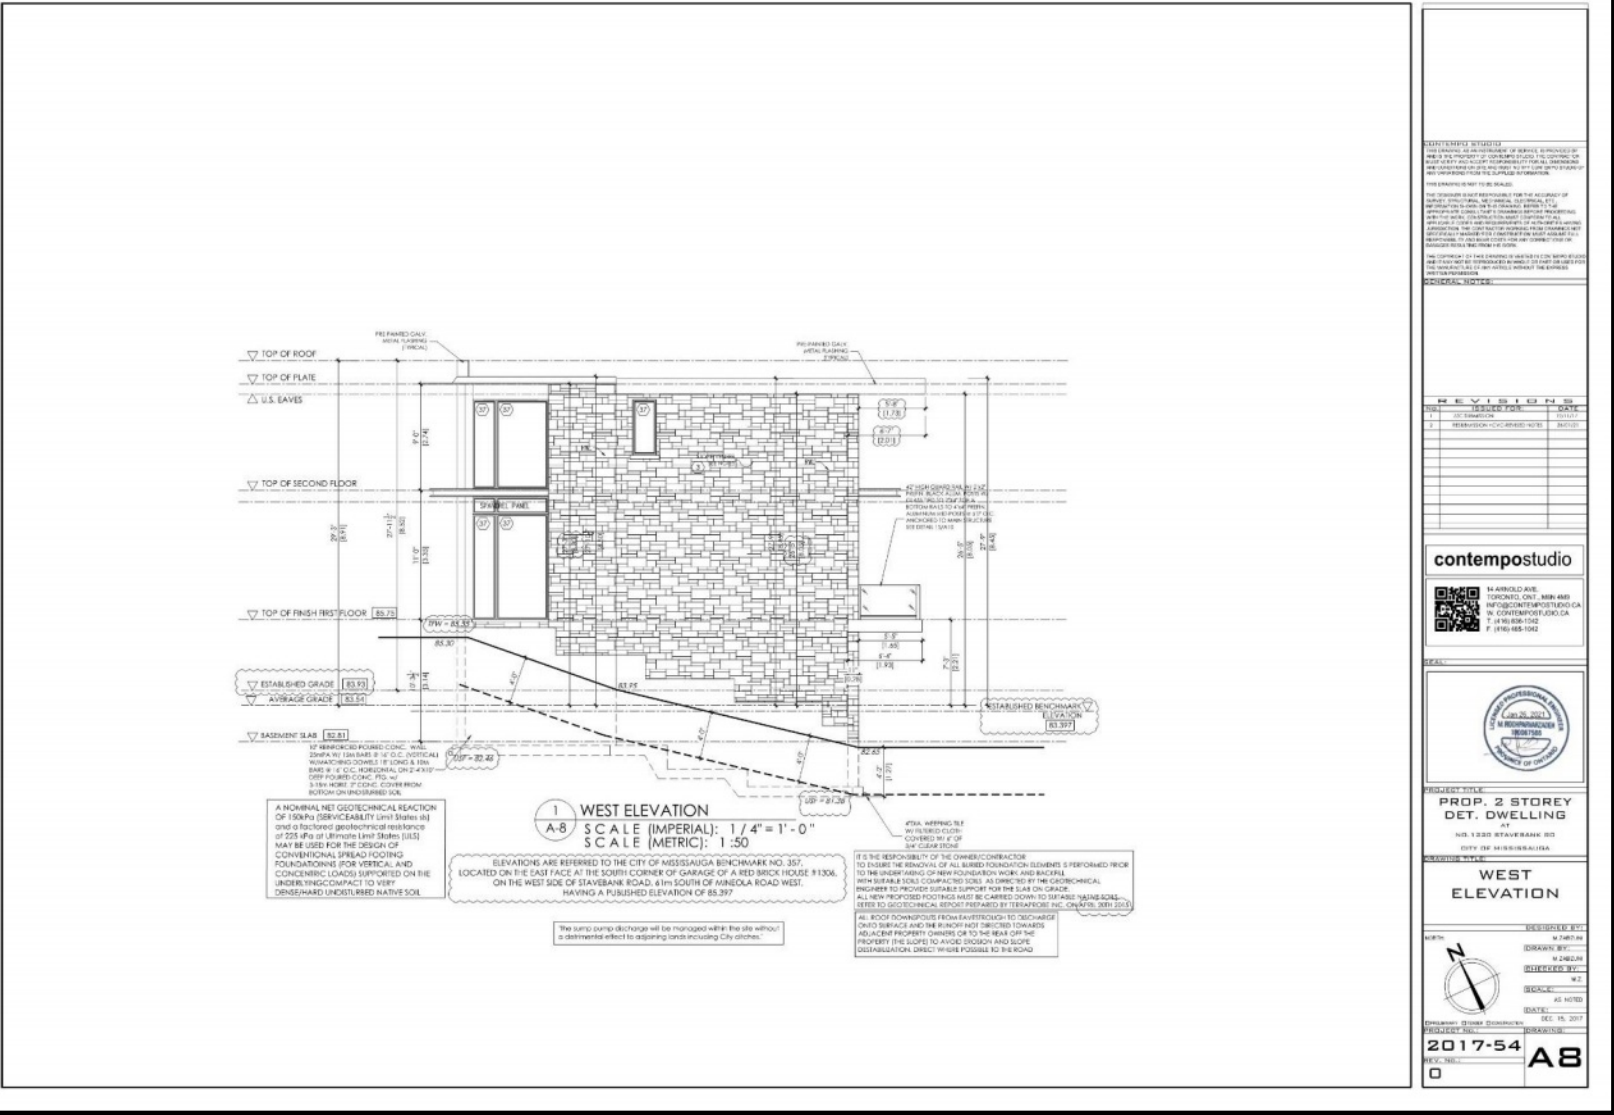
Proposed Development- West Elevation (Contempo Studio 2021)
